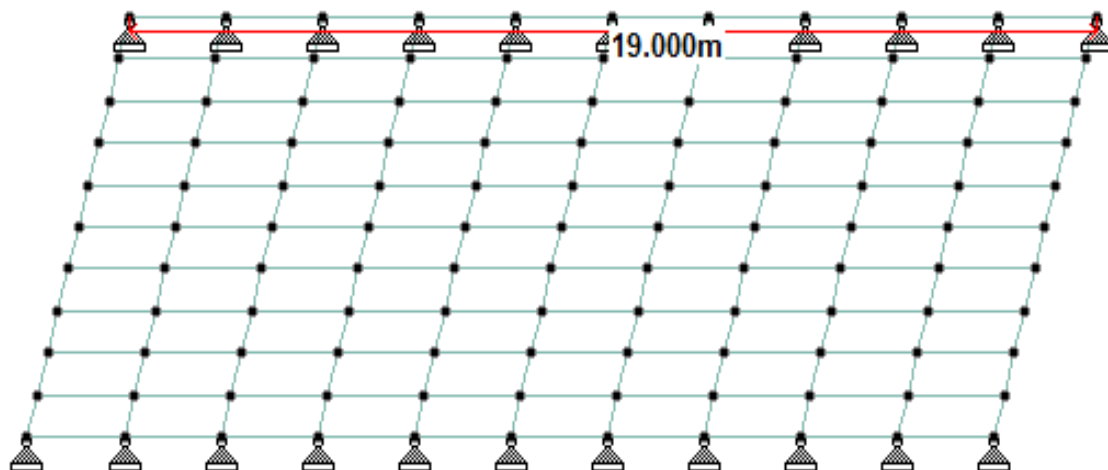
Plan view of slab with 19m span length at 15° skew angle
